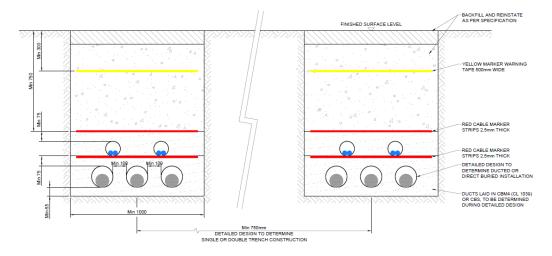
Typical Cable Trenching Cross Section – Ducted Flat Arrangement
